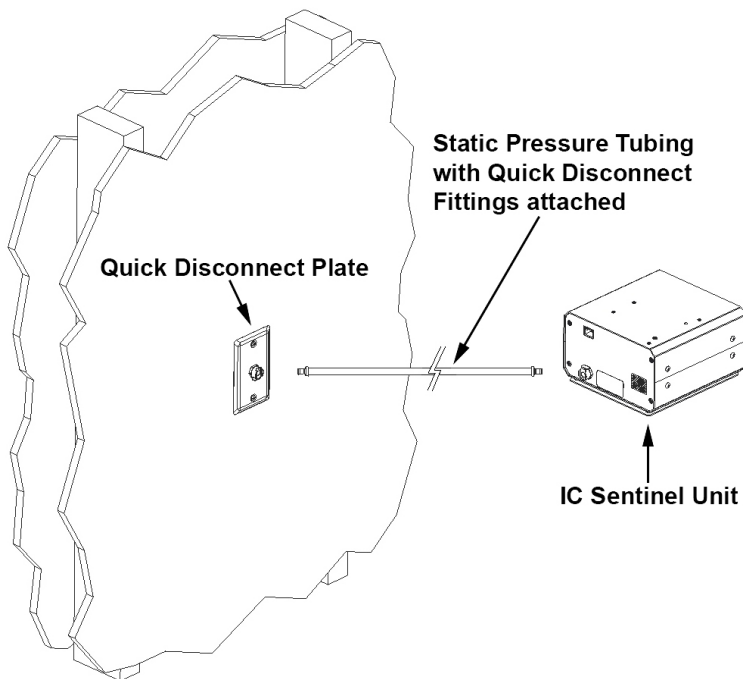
Installation of Quick Disconnect Fittings to Static Pressure Tubing
